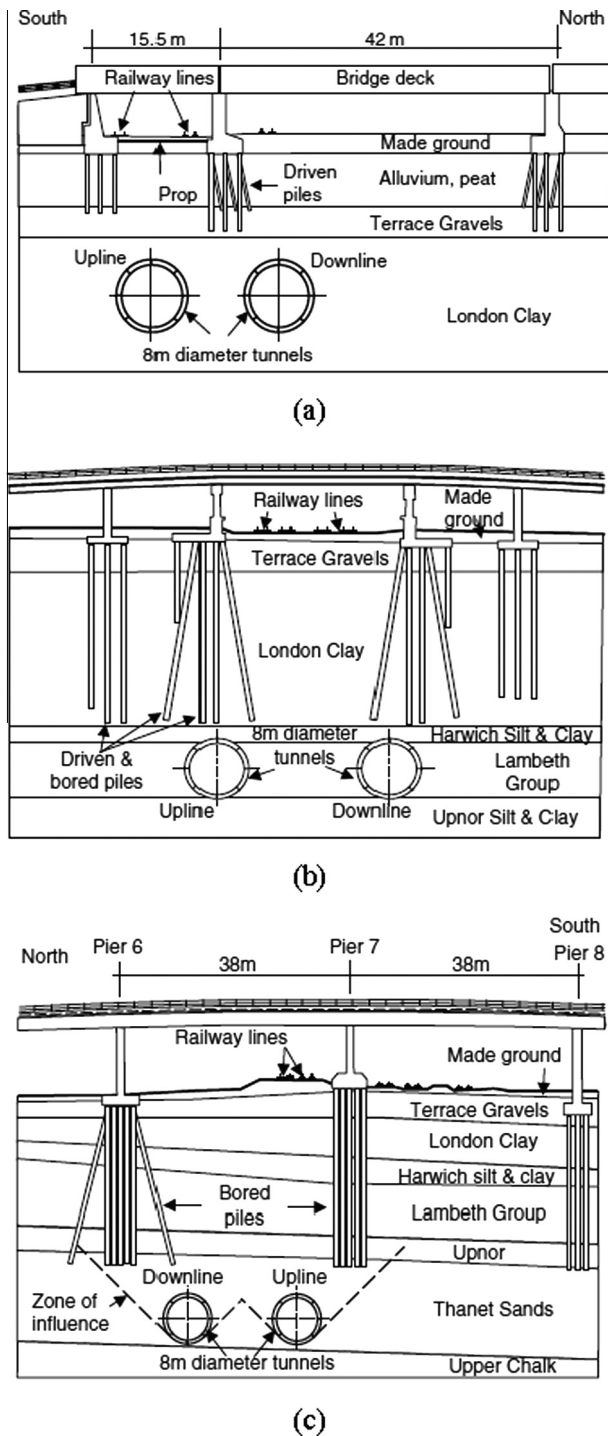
Three typical sections showing tunnelling under (a) Renwick road bridge; (b) Ripple Road Flyover and (c) A406 viaduct bridge in piled bridges in the Channel Tunnel Rail Link project [13].
